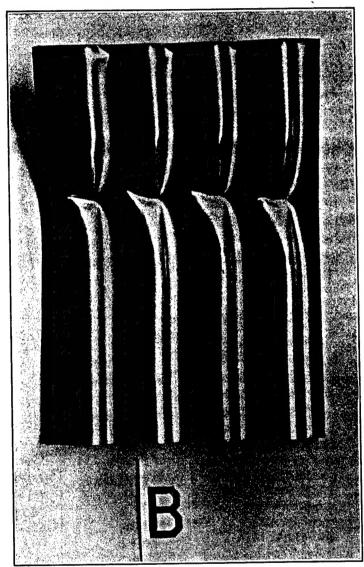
Column Failure of Corrugated Sheet with Flat Sheet Attached.
